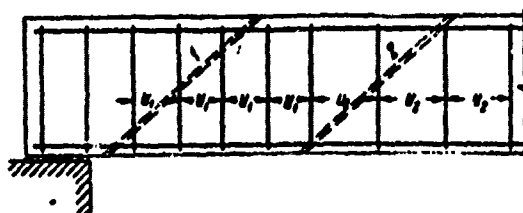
Locations of the most dangerous inclined sections. 1 - section, passing through the support face; 2 - section, passing through the point of variation in intensity of the transverse reinforcement situated at the level of the tensile stressed reinforcement.
